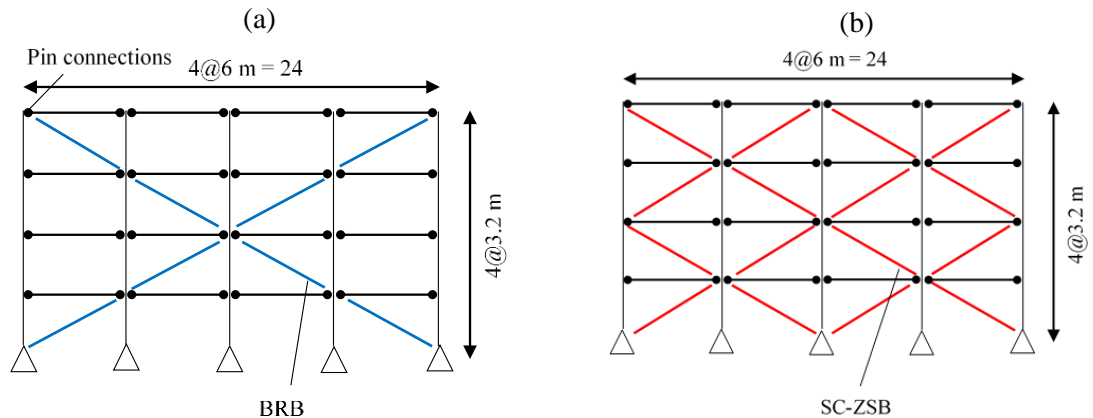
(a) 4 story building with BRB and (b) 4 story building with SC-ZSB brace
